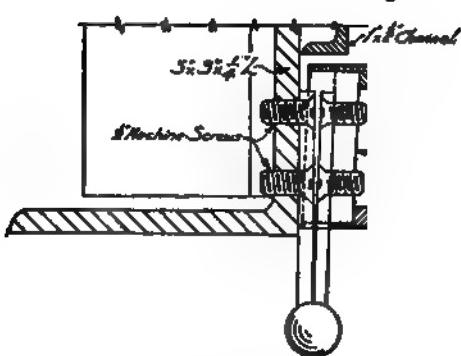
Hollow-Steel Underwriter Door with Butt and Lock.
